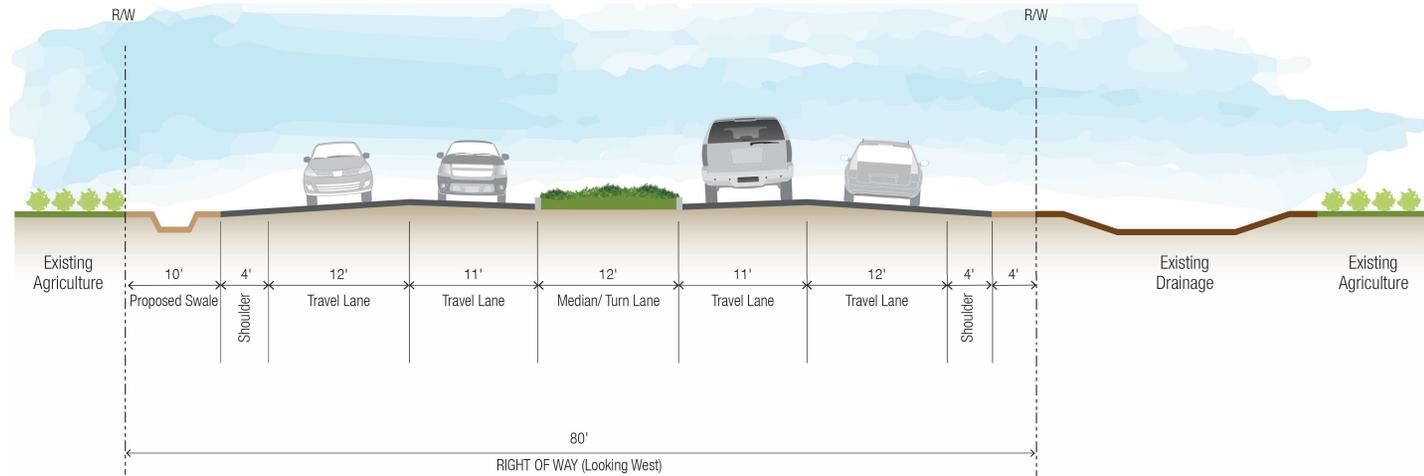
4-Lane Arterial Section--Vista Lucia Parkway west from Fanoe Road to Gonzales Slough Looking West
